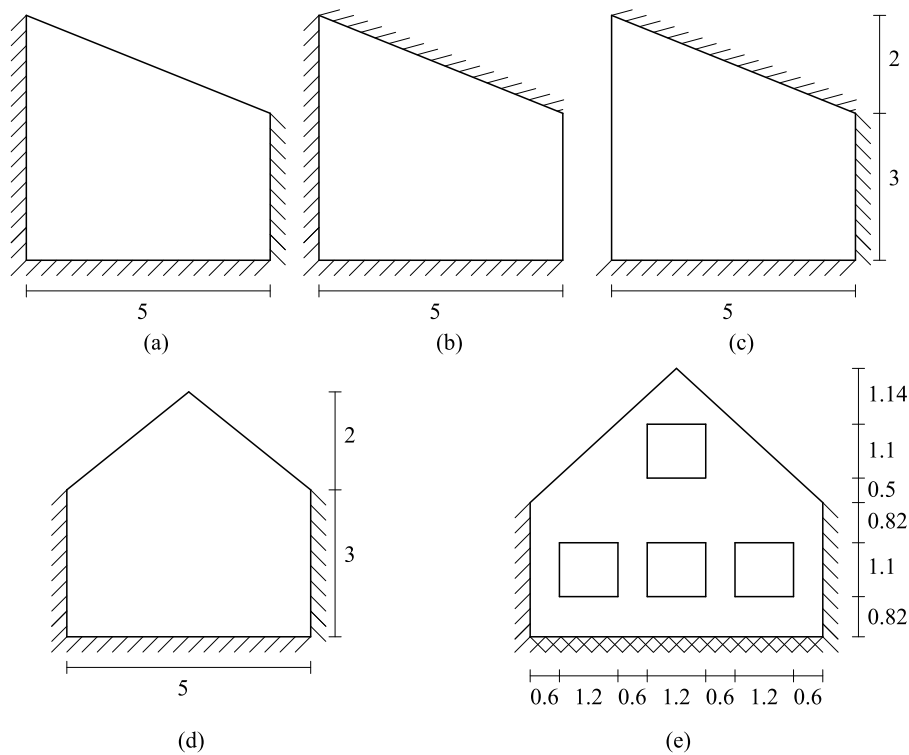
Gable walls - geometry and boundary conditions: (a-c) walls with various boundary conditions; (d) wall with pitch; (e) wall with pitch and multiple openings. All dimensions are in metres.
